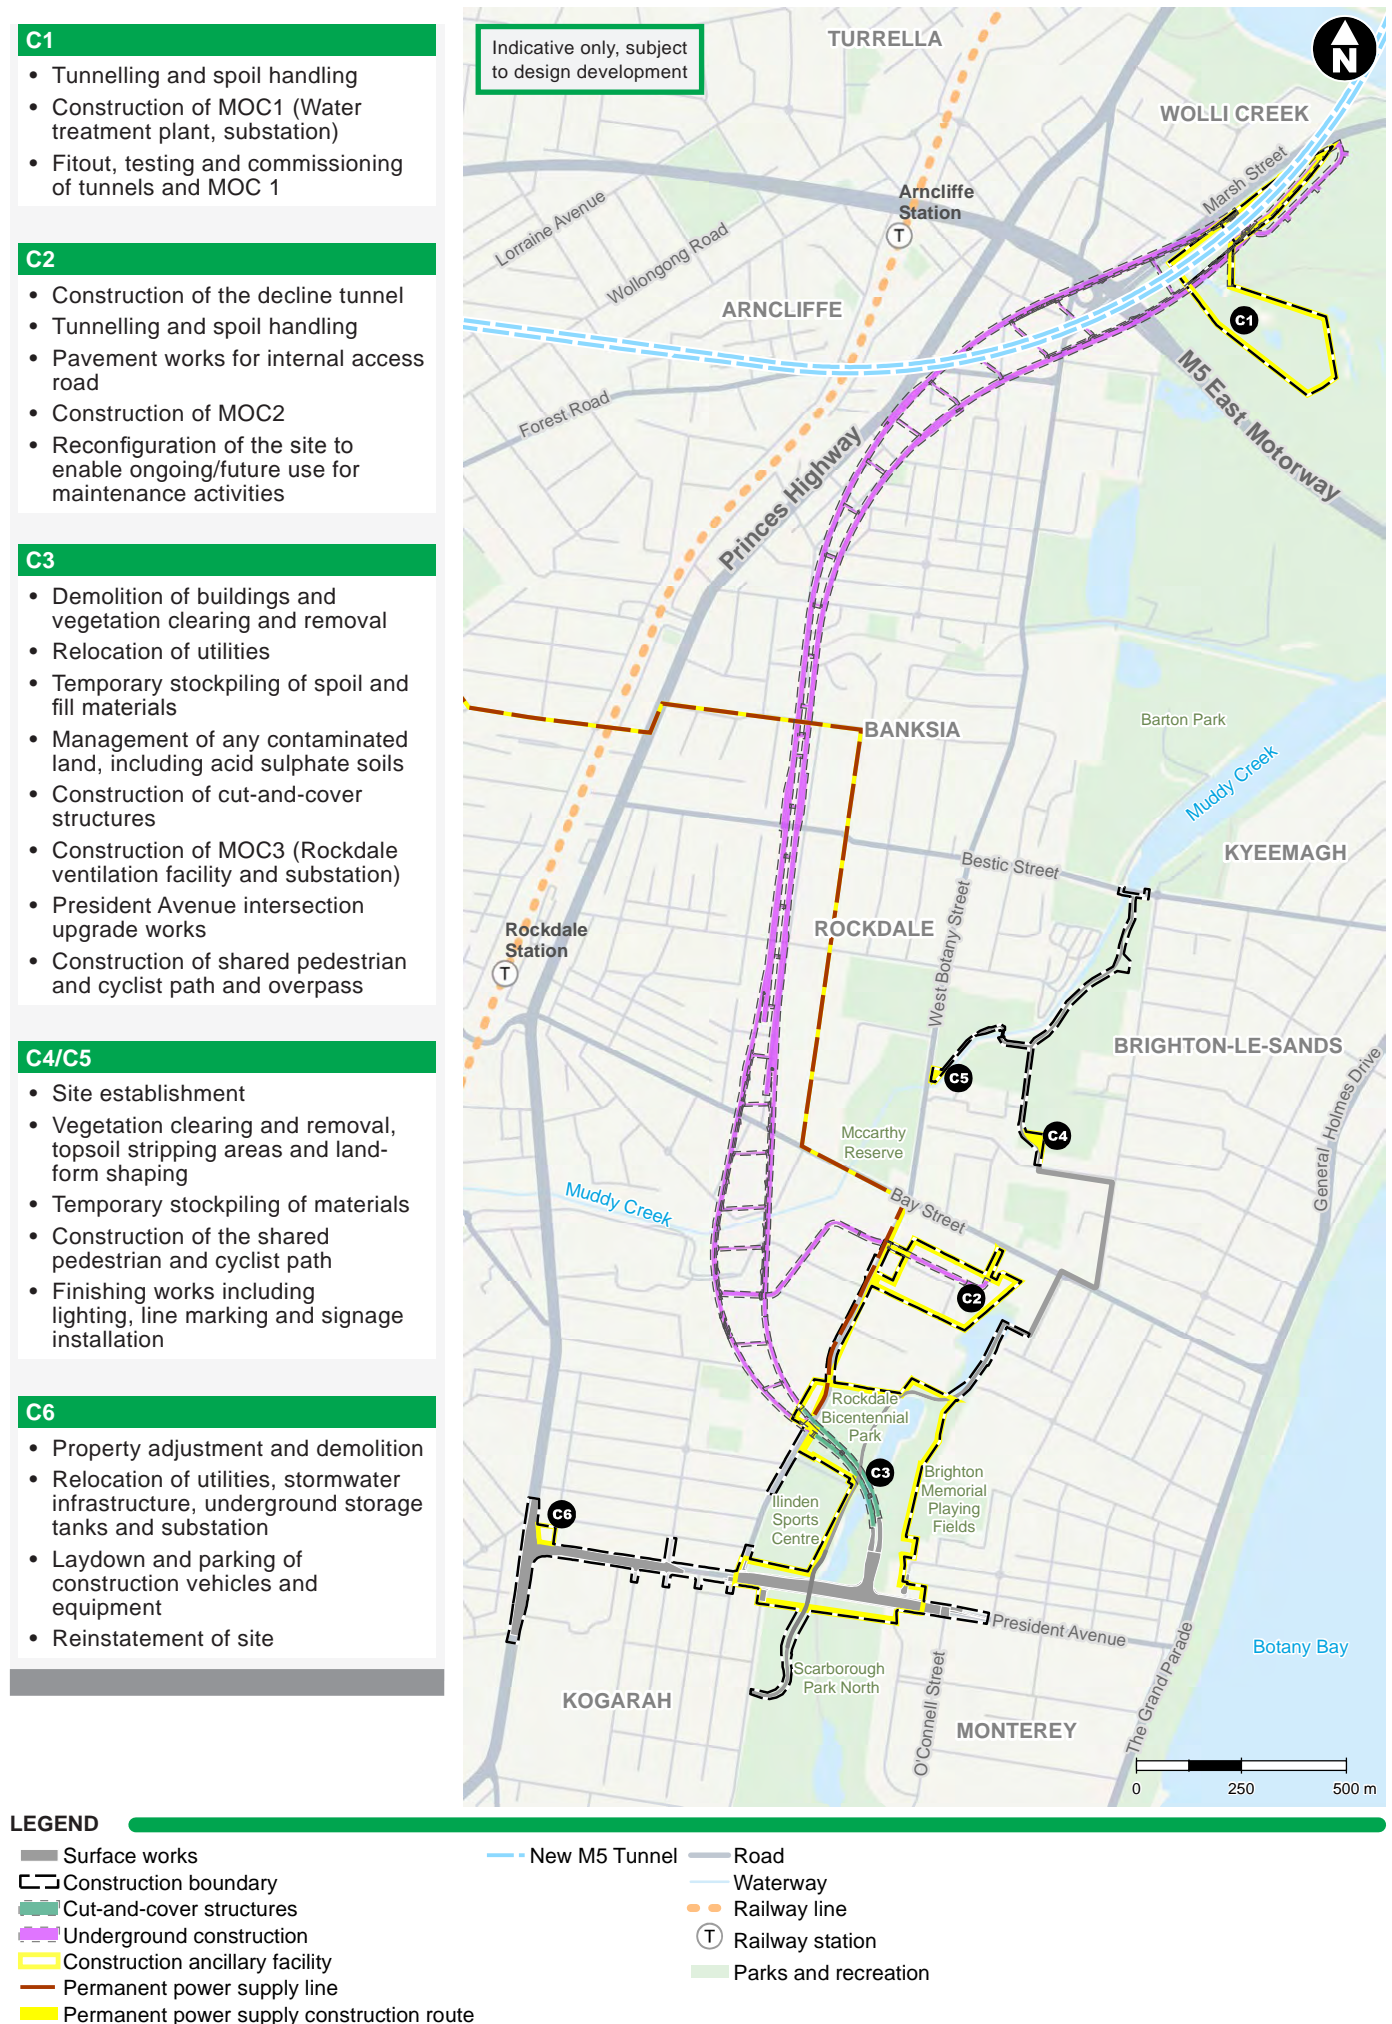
Overview of construction boundary and construction ancillary facilities
